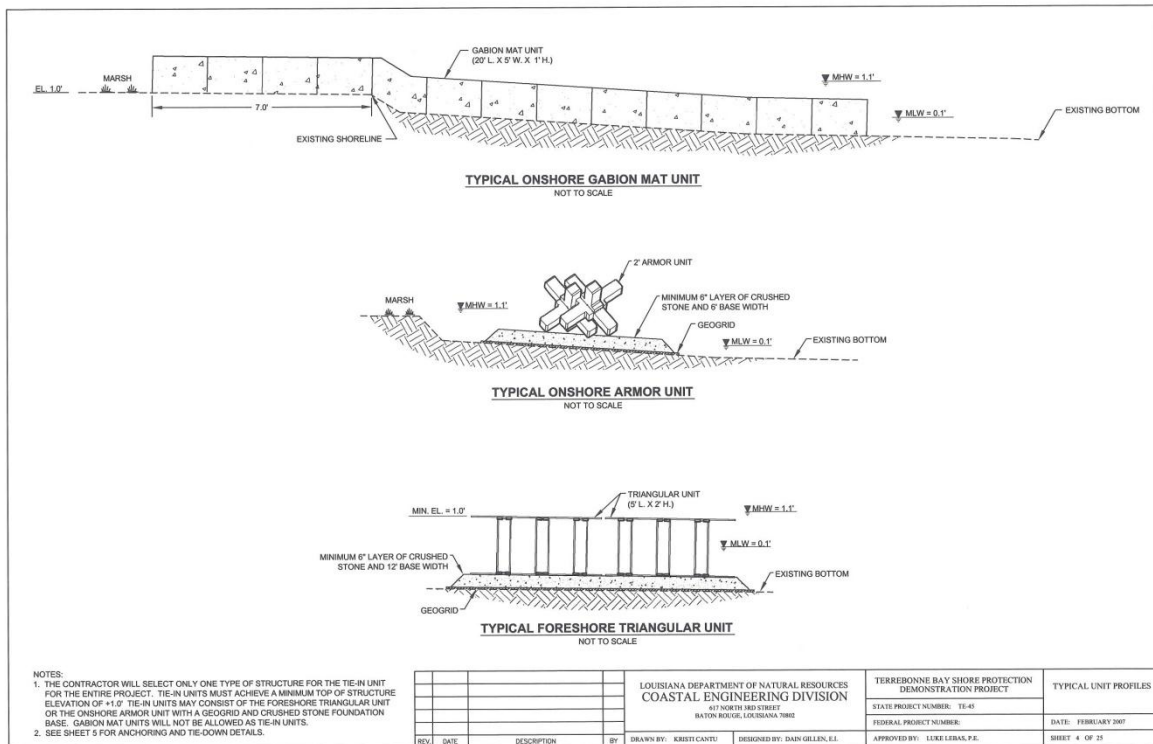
Typical cross sections showing the Terrebonne Bay Shore Protection Demonstration (TE-45) project's shoreline protection structures.
